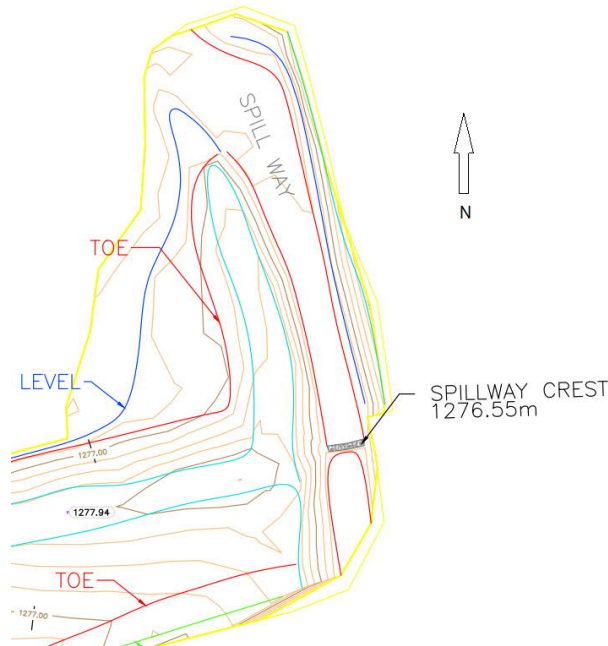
Spillway Plan at Elinor South Dam Site – (Okanagan Survey, 2012)
